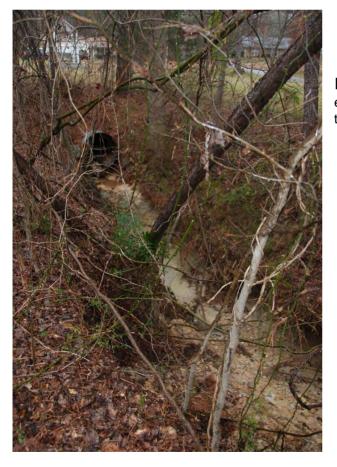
Downstream end of culvert looking east towards Ridge Way.
